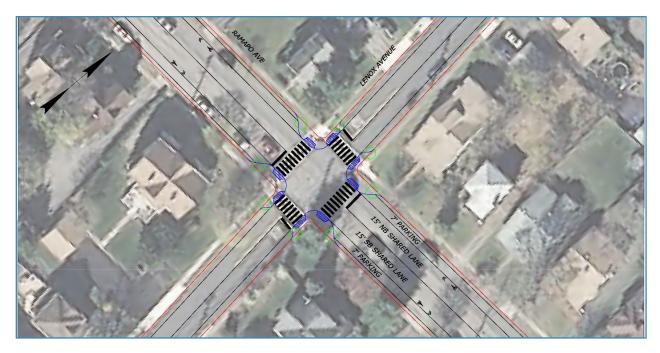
Example of Traffic Calming Treatments-Ramapo Avenue and Lenox Avenue
